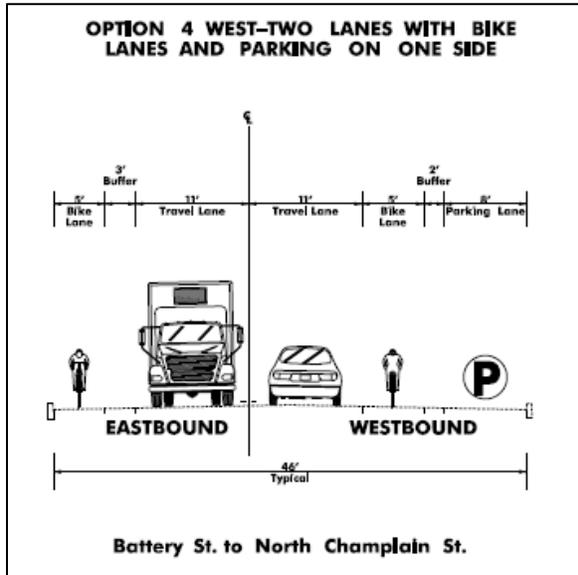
Two-Lane Roadway Cross Section with Parking on One Side West
